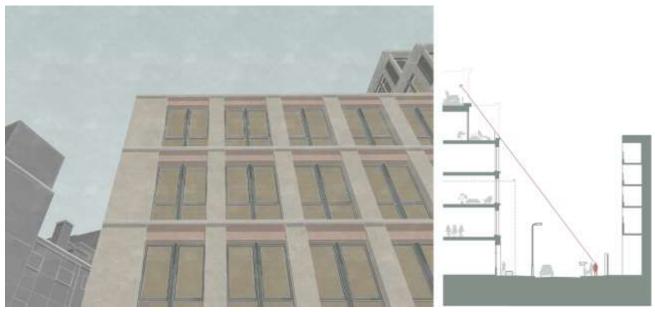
CGI of the 'sightline' from the pavement of the proposed building as seen from 10 Epworth Street
